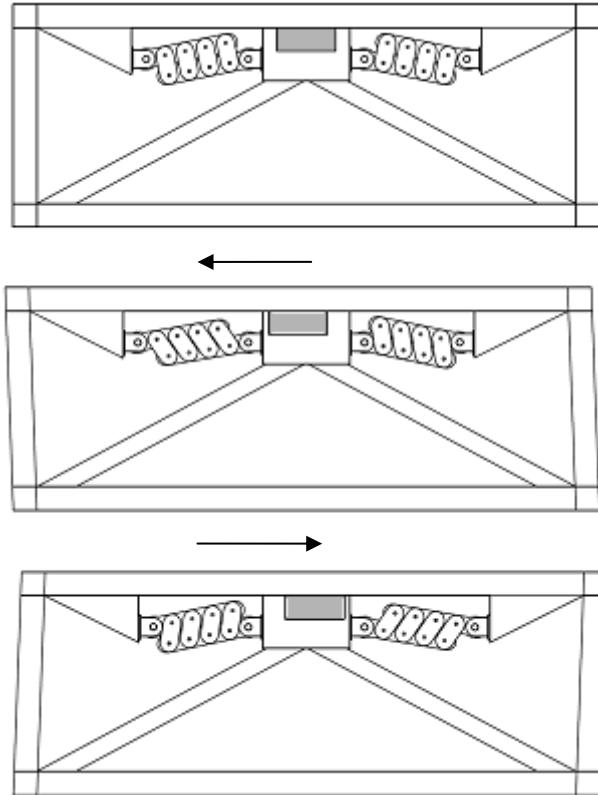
Top: Damper installed with diagonal bracings in frame structure in initial position. Middle: Frame structure moved to the left. Bottom: Frame structure moved to the right.
